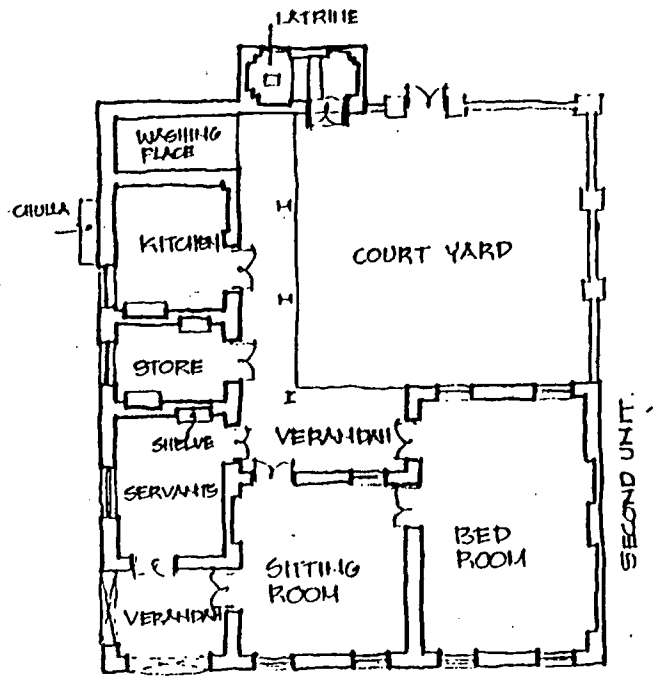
First floor plan, two storied one unit twin quarter
